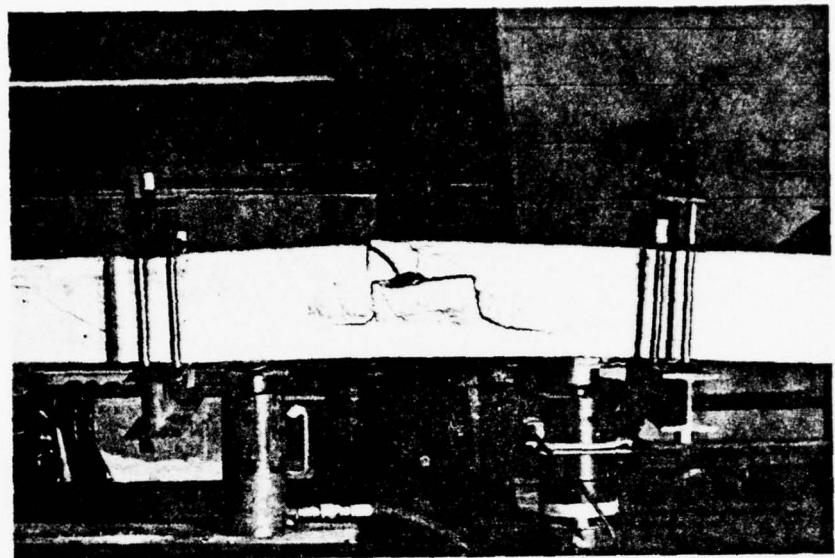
Failure in Test Specimen T-2-E After Yielding of the Tensile Reinforcement. Splice Length = 8 inches.
